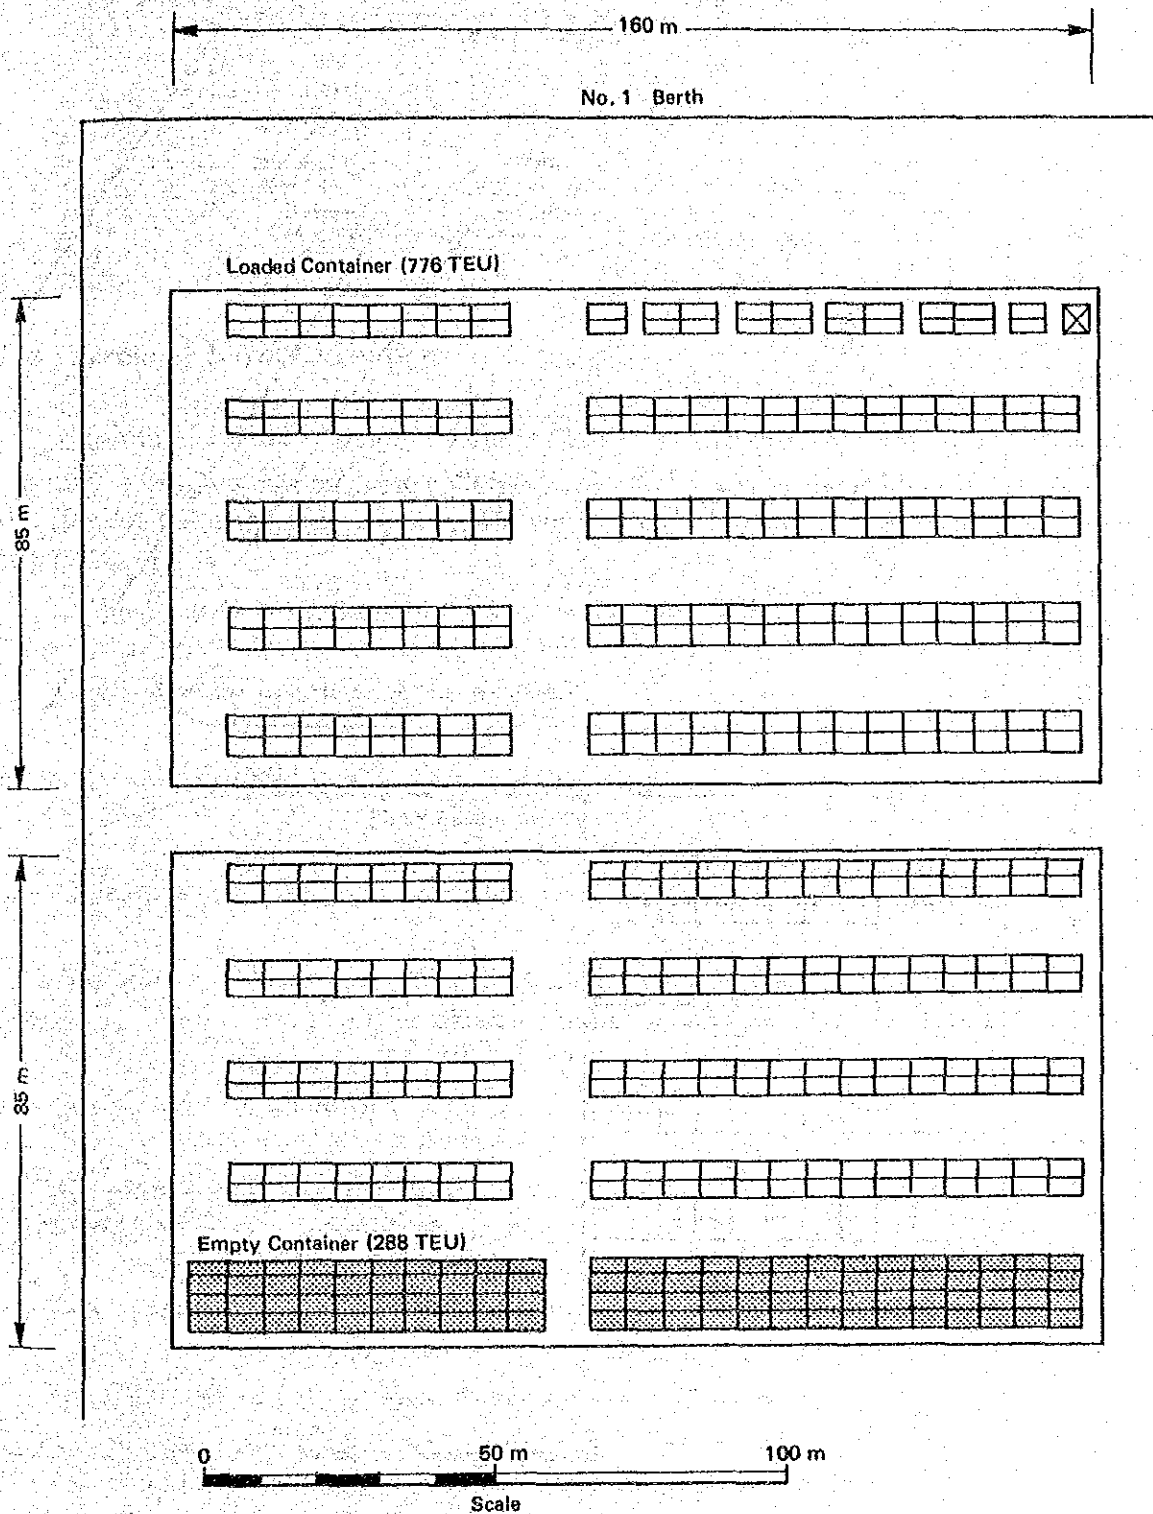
(a) Container Yard Slot Arrangement Plan
